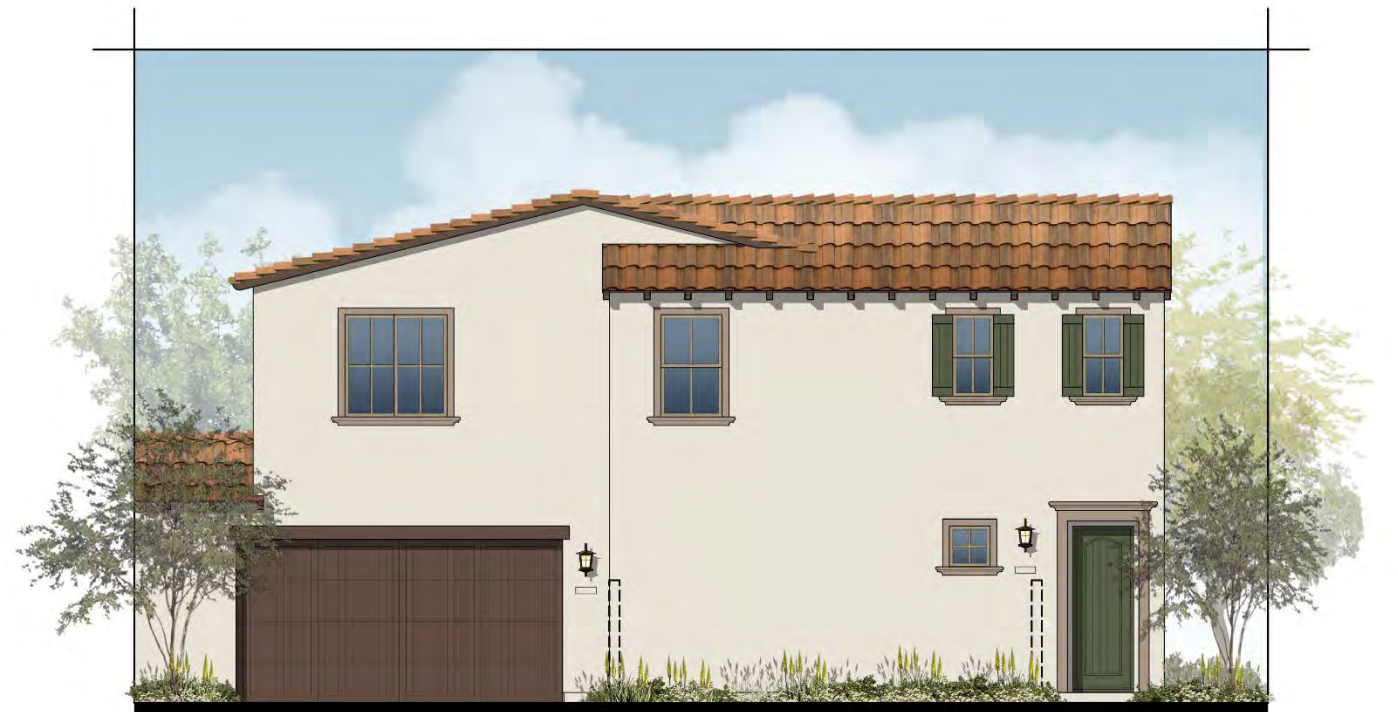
Cluster Product – Typical Elevations (Plan 2)
